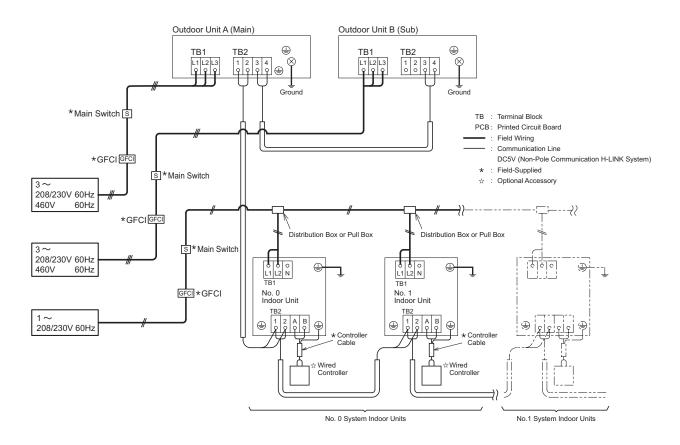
Instruction for Electrical Wiring Connection (Heat Pump System)
